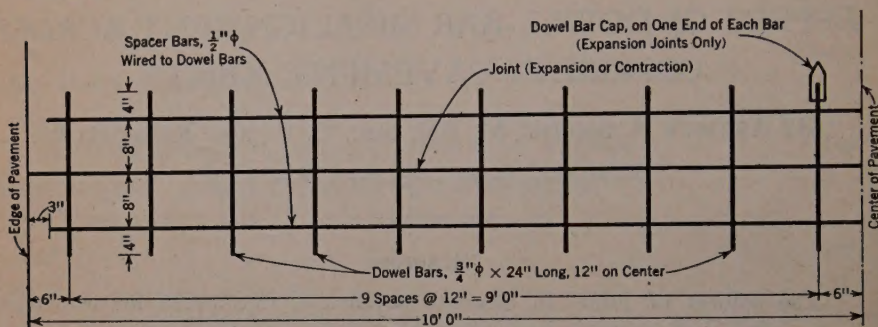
TYPICAL DOWEL-BAR ASSEMBLY IN 20-FOOT PAVEMENT.
